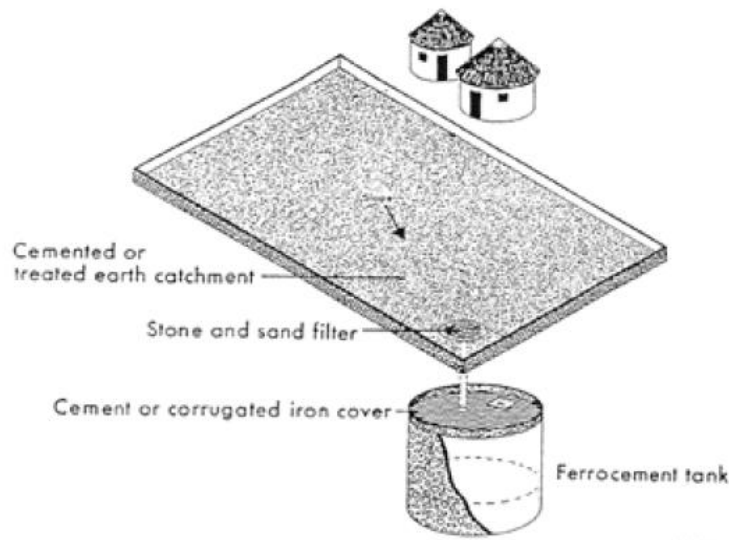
Typical Rainwater Harvesting Schematic (Design Recommendations).
